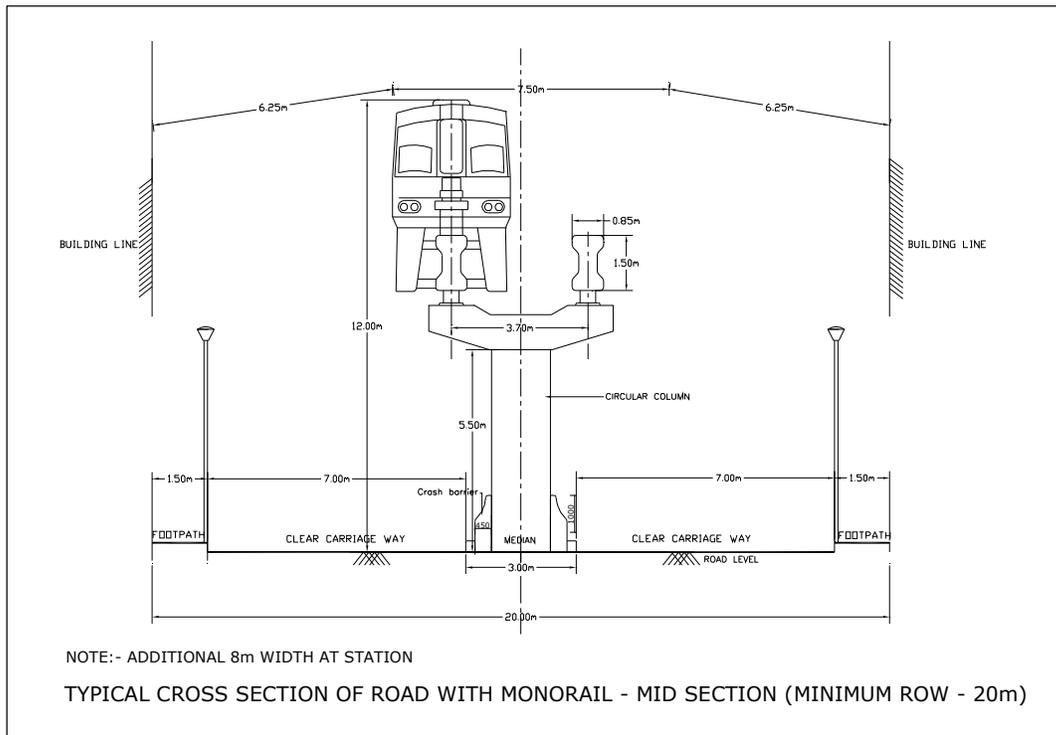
Typical Cross-Sections of Road with Elevated LRT and Monorail
